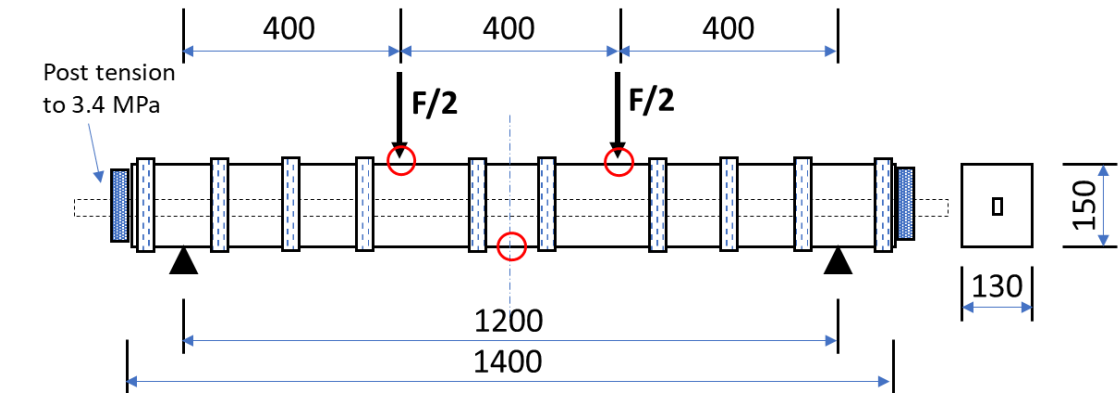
Geometric and CFRP wrapping details of the 3D printed beam under the four-point loading test (drawn by Dr. L. Zheng)
